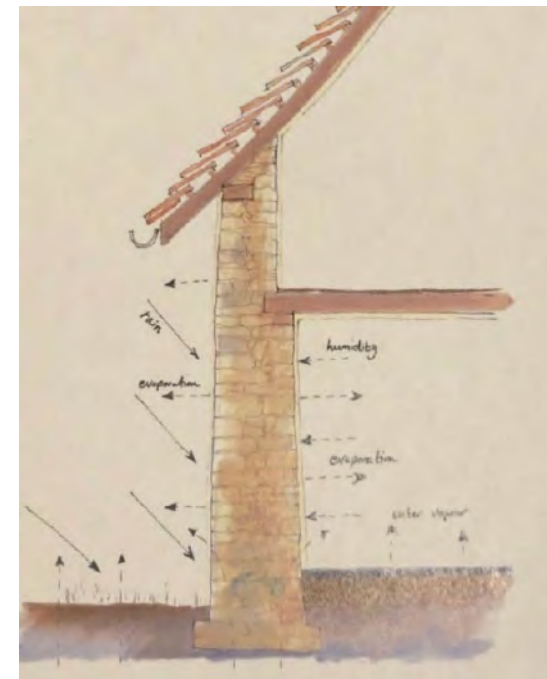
Traditional Building Construction: lime plaster inside, lime pointing, lower ground level outside, wall gets wet & dries out constantly. Earth outside absorbs the runoff, and it is much lower than the inside floor.
